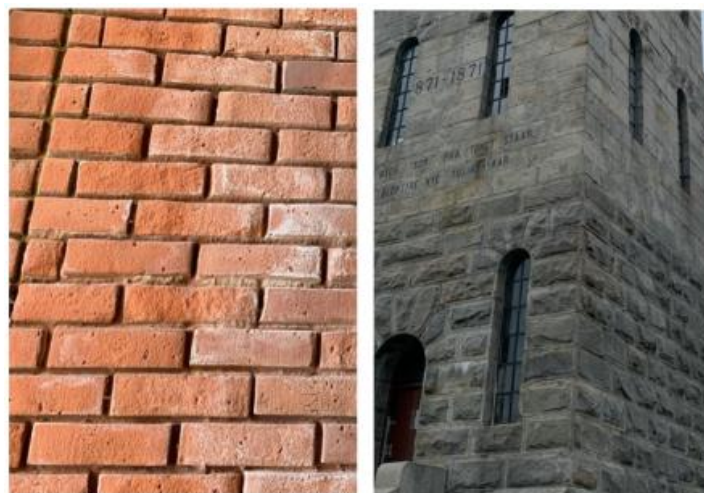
Internal and external material layout of the Slottsfjell tower [1]
